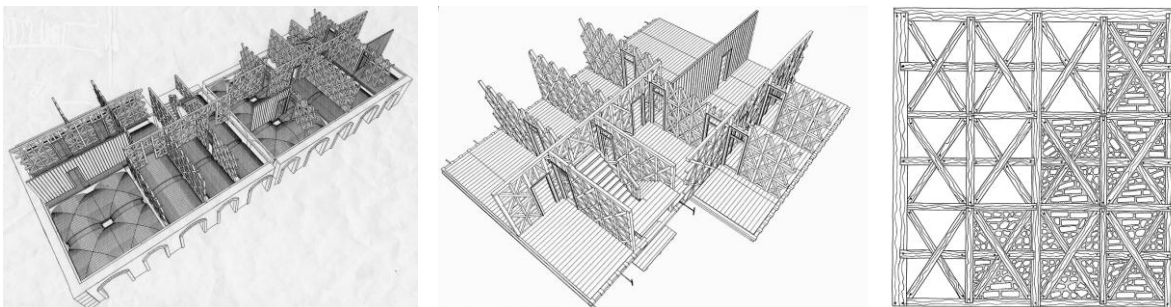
12- Schematic axonometric representation of a typical masonry basement, Figure 3. 13- Schematic axonometric representation of a typical floor, Figure 3. 14- Detail of a Pombalino system wall.
